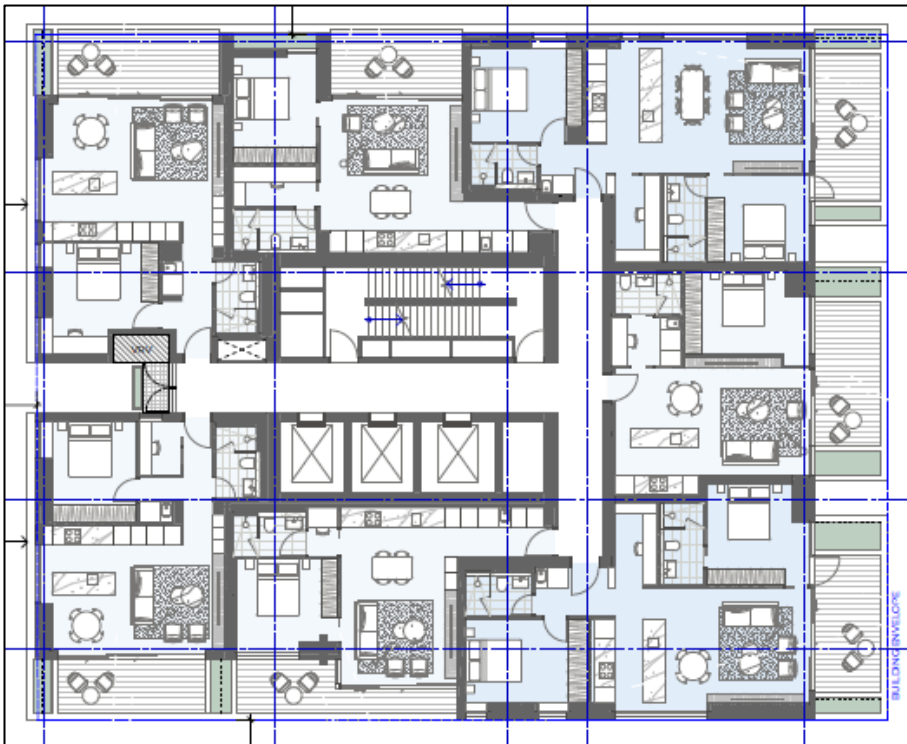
PROPOSED TYPICAL RESIDENTIAL FLOOR PLAN
